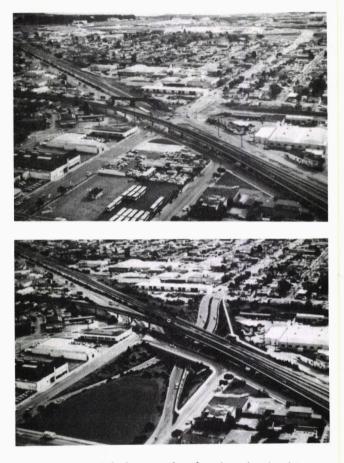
Aerial photographs of project site: (top) project site before construction, looking south; (bottom) artist's conception of finished project, looking South (Carlson Boulevard Overcrossing in foreground).
